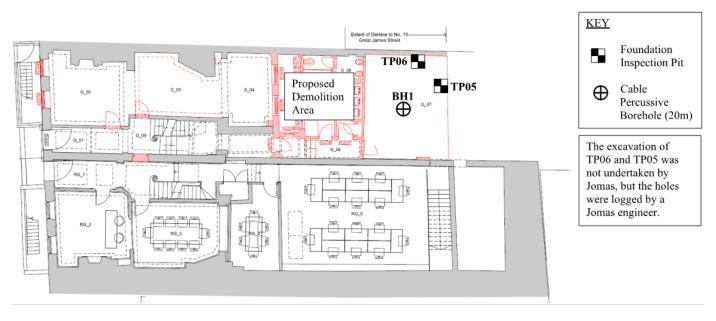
Site-specific ground investigation - plan of intrusive works - existing ground floor level.
